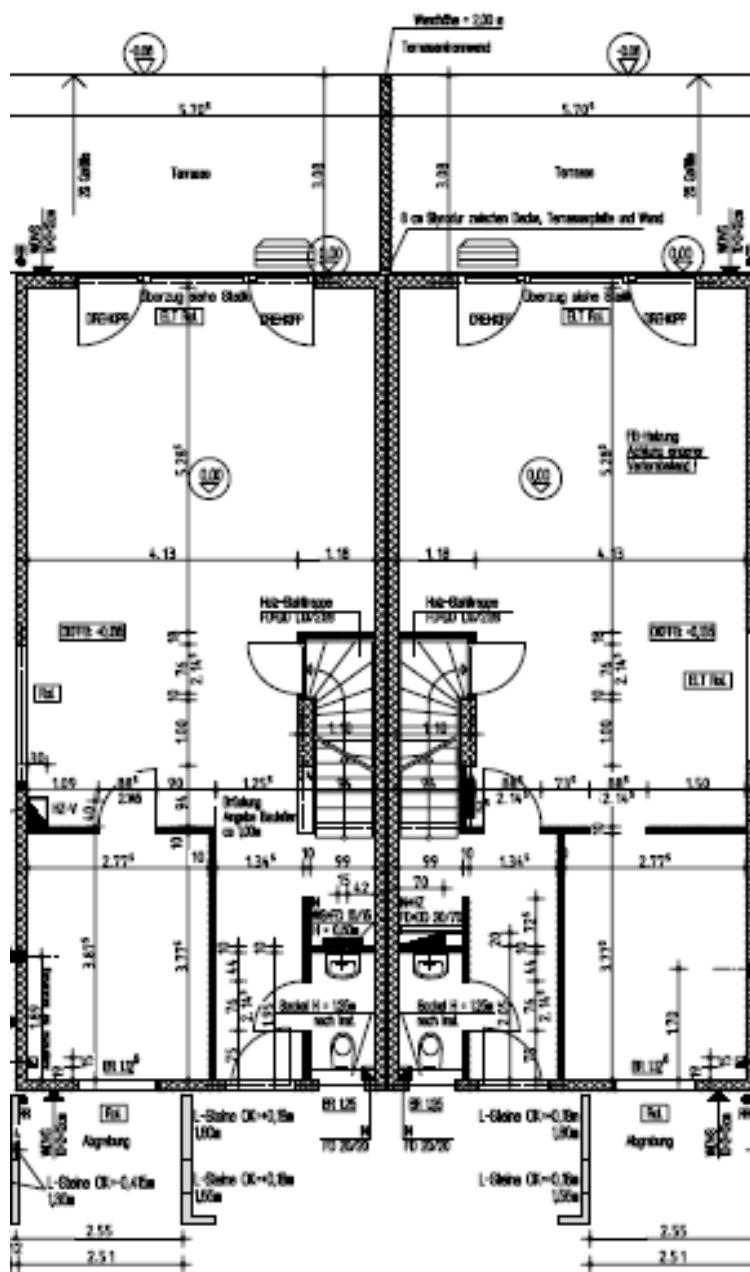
Terraced house, building location: Aachen, earthquake zone 3
